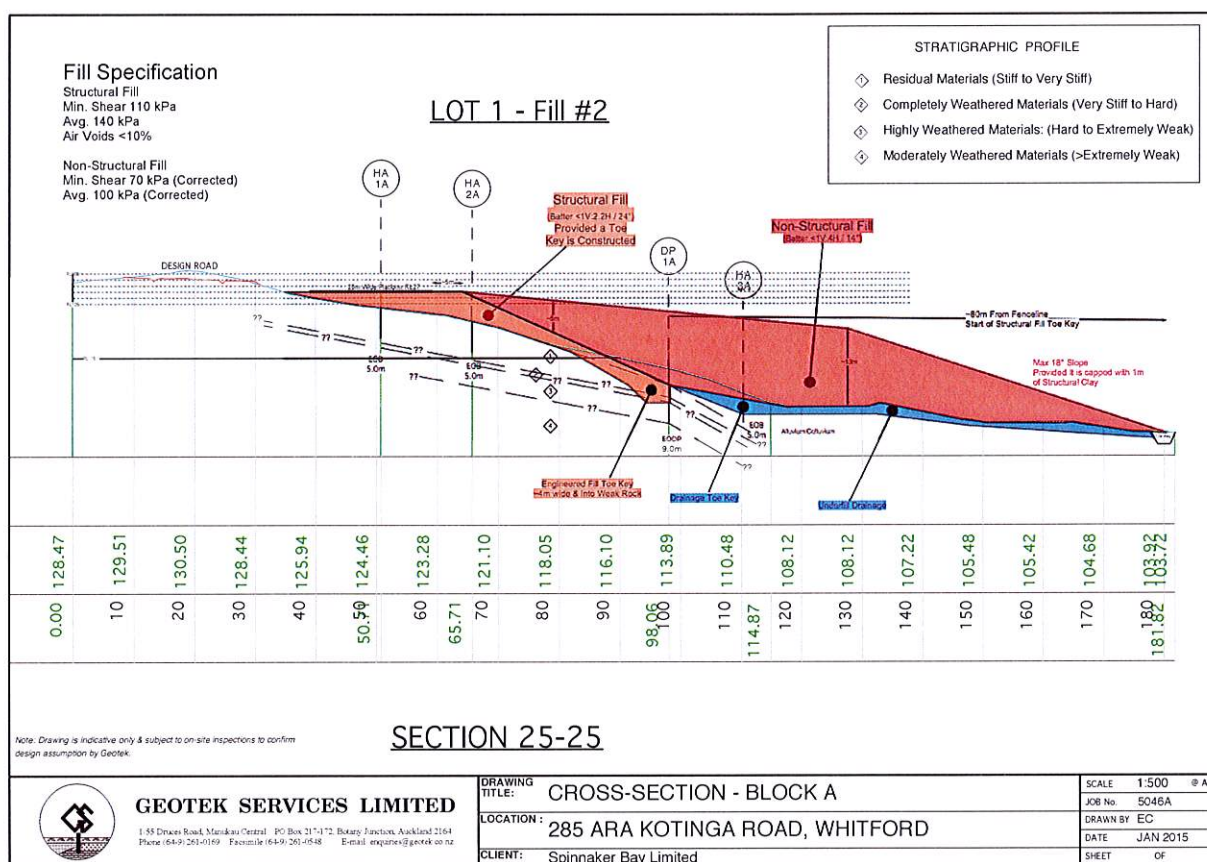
Lot 1 Embankment Gully Fill Design & Earthworks Specification
